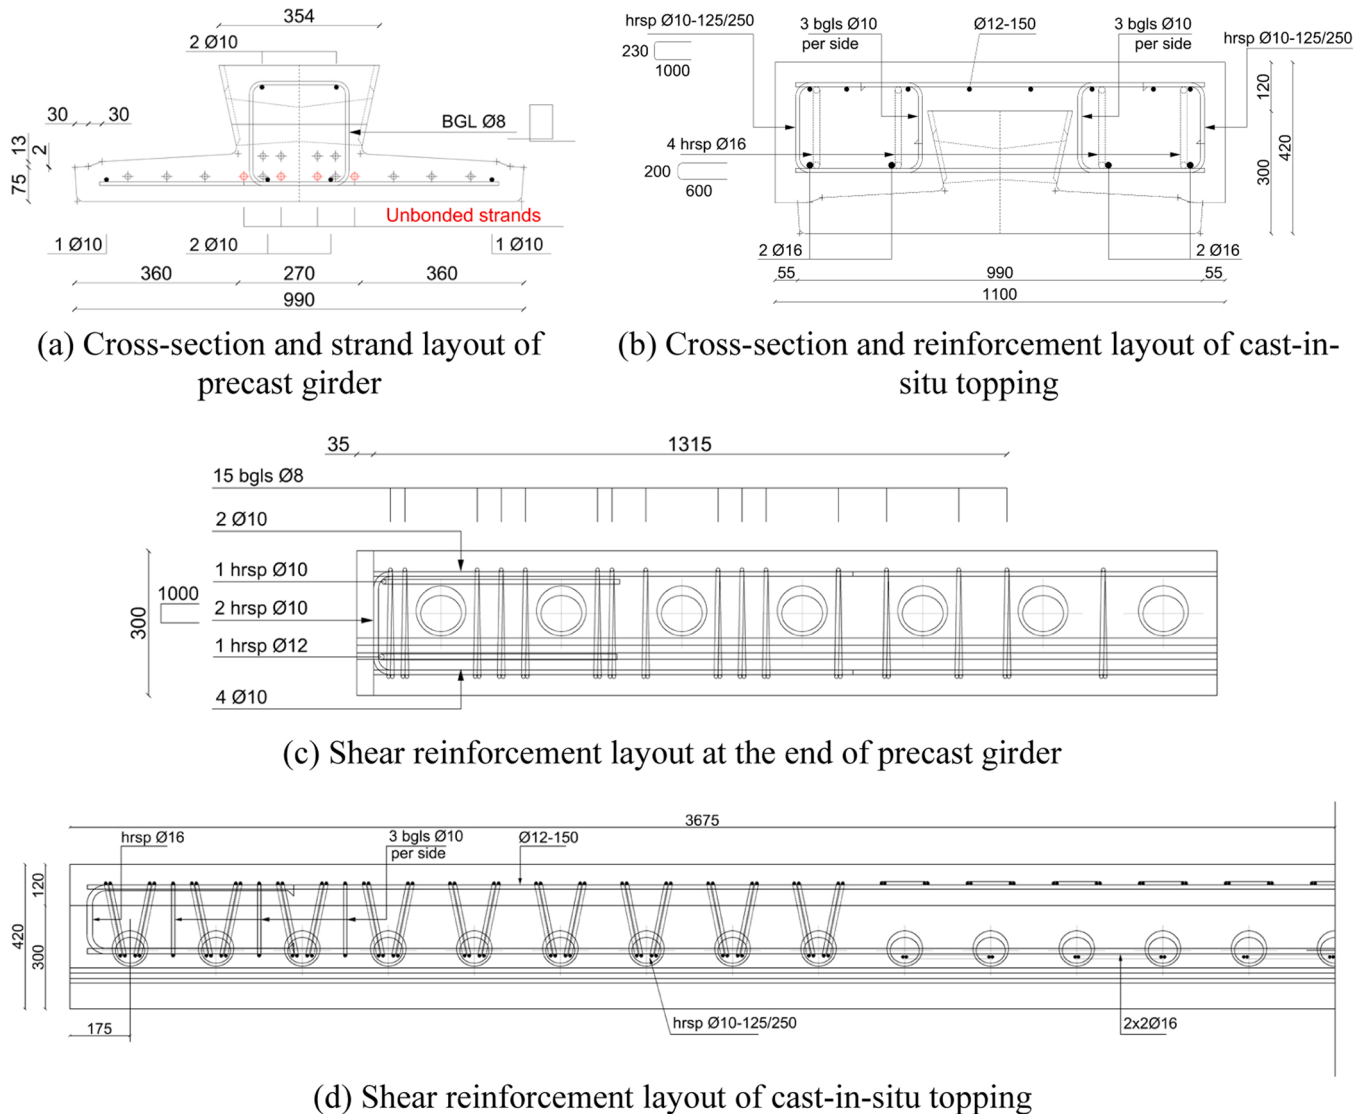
Geometry and strand/steel layout of precast girder/ cast-in-situ topping (Unit: mm).
